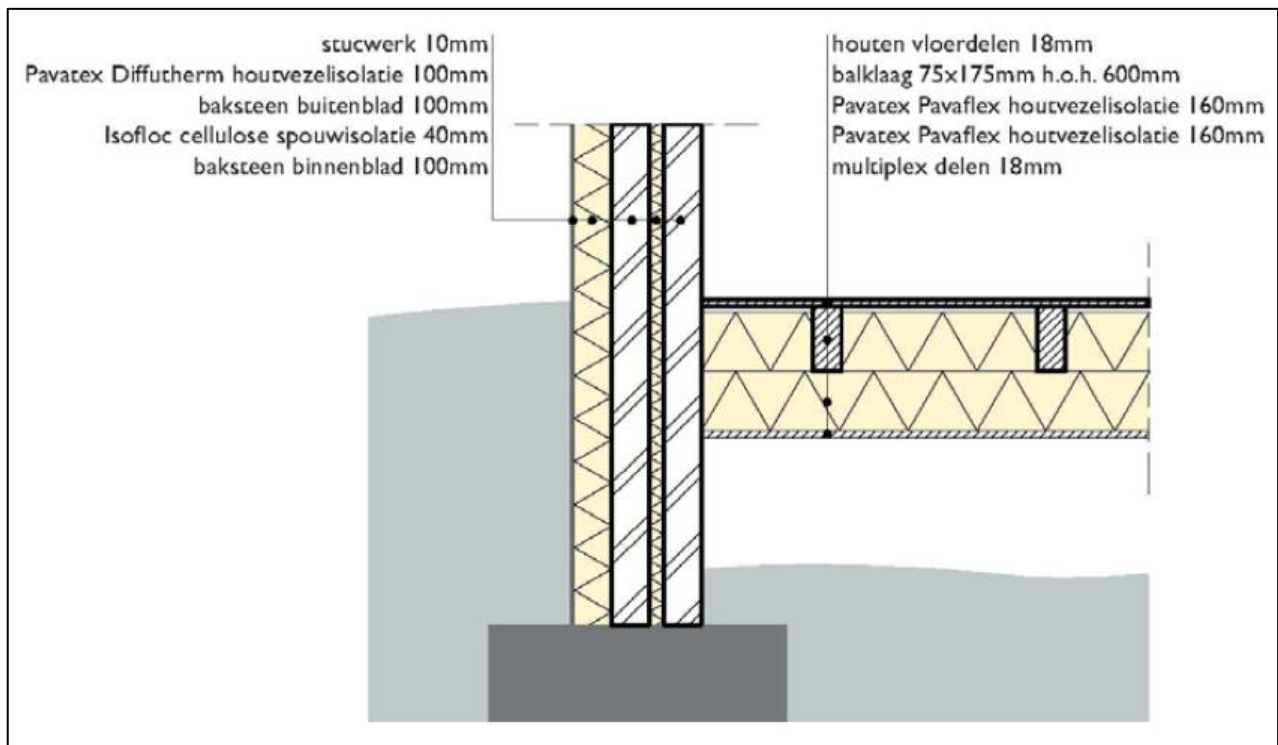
Brick Solution Exterior Insulation Variation 1 Cross Section Detail (Haagen, 2015)
